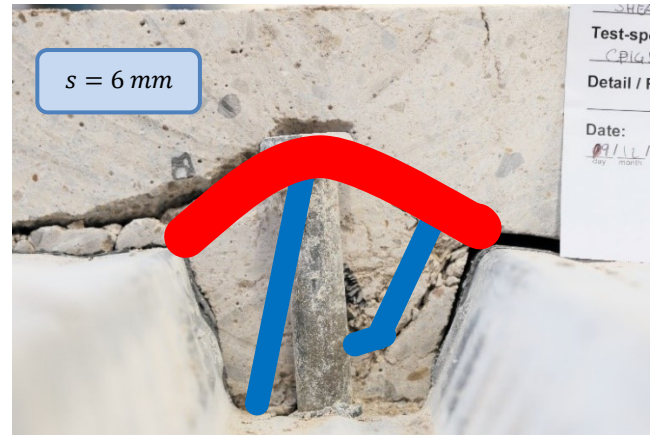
Concrete damage observed in the concrete rib after cutting a push-out test specimen at a slip displacement of 6 mm.
